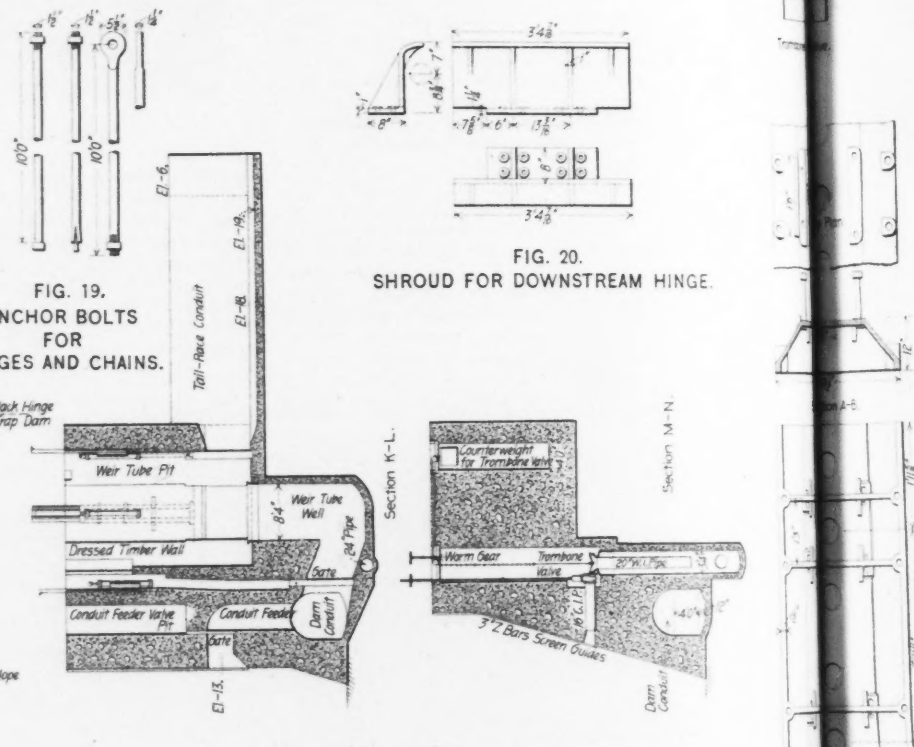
SHROUD FOR DOWNSTREAM HINGE.
